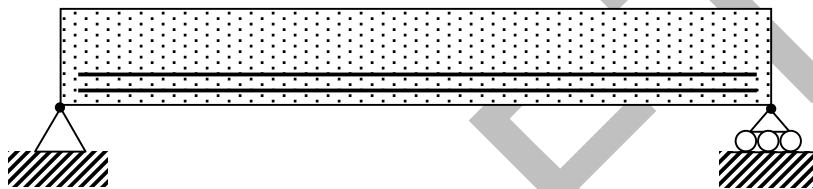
A reinforced concrete beam, the rods are placed on the tension side of the beam.
